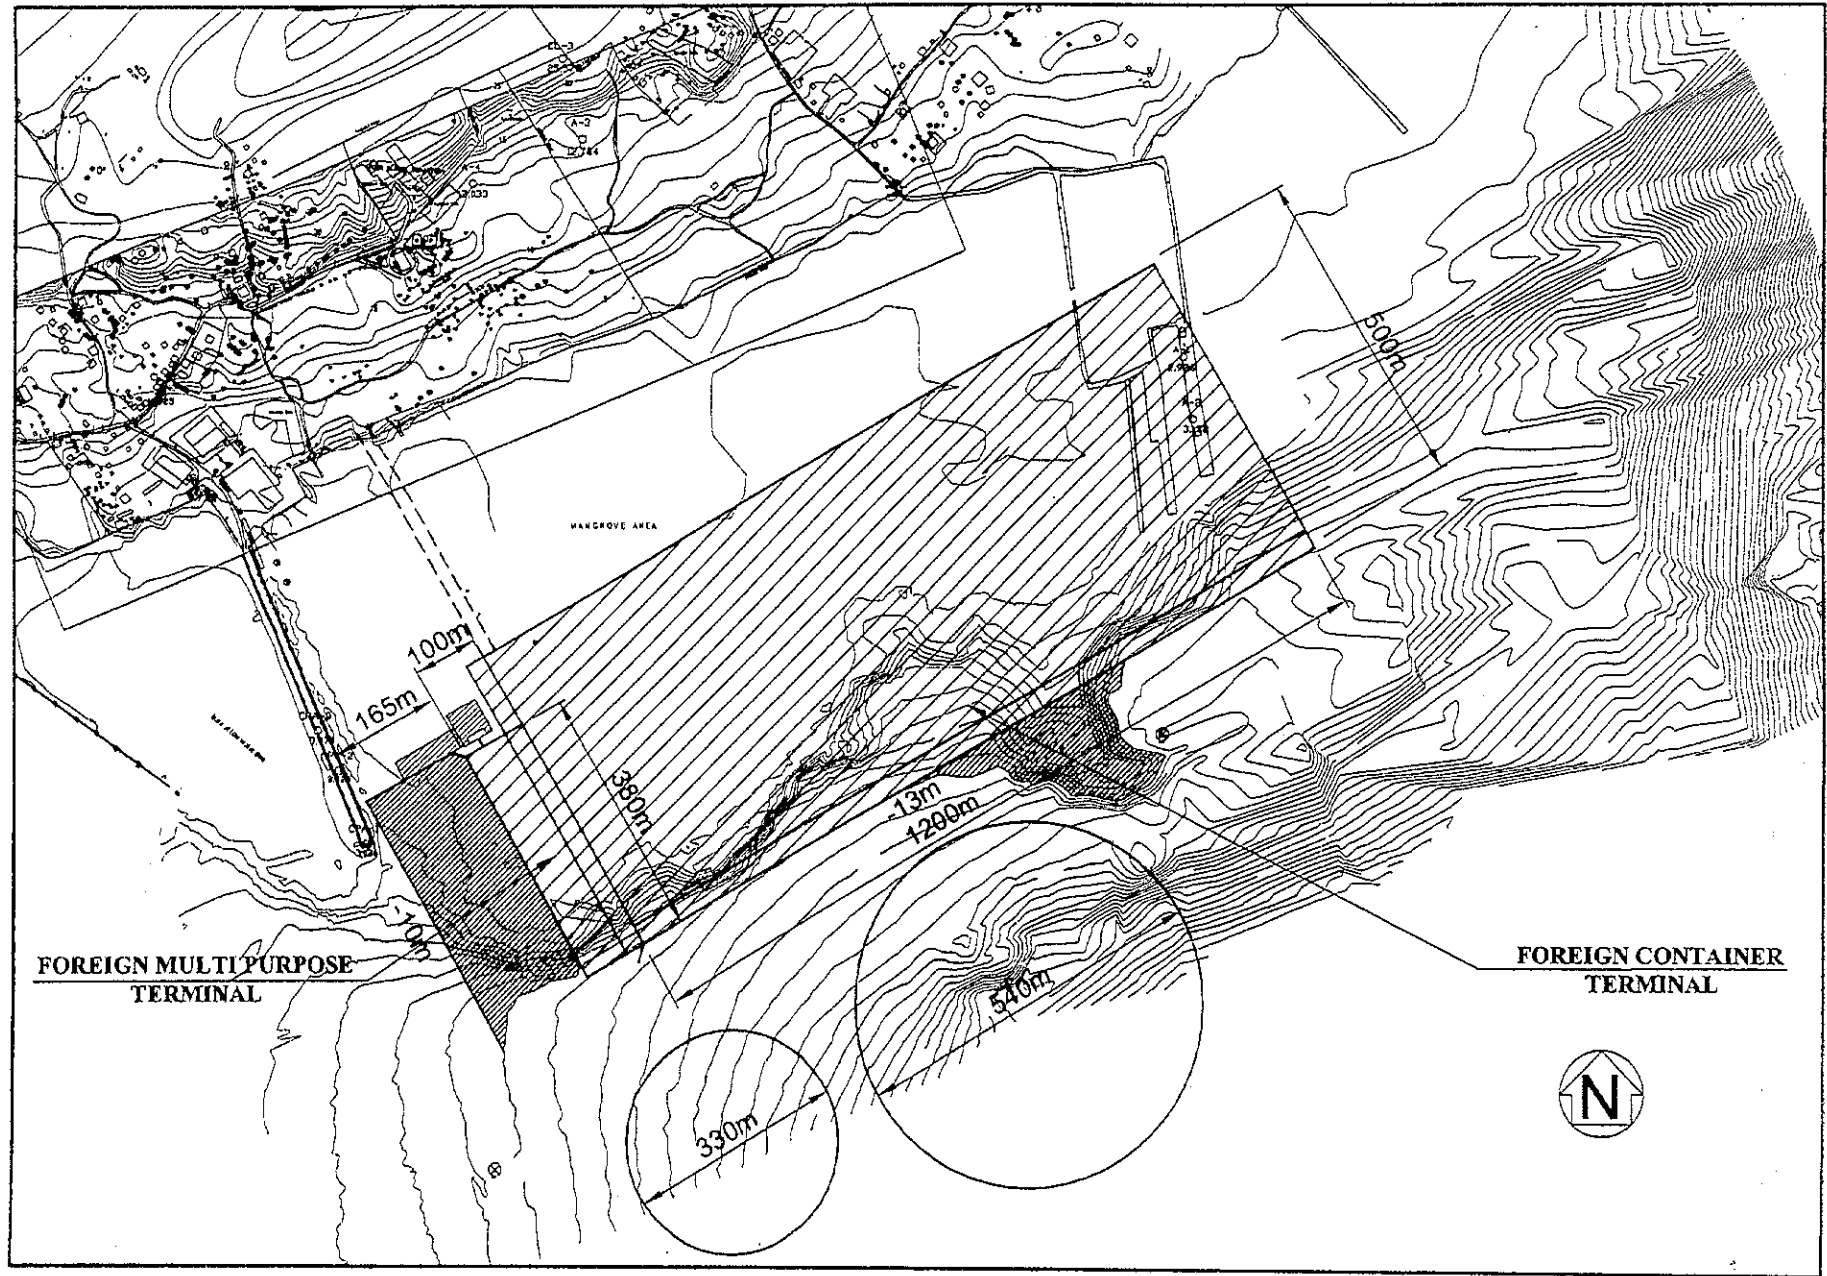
New Cebu Port Layout Plan (Alternative 1)
